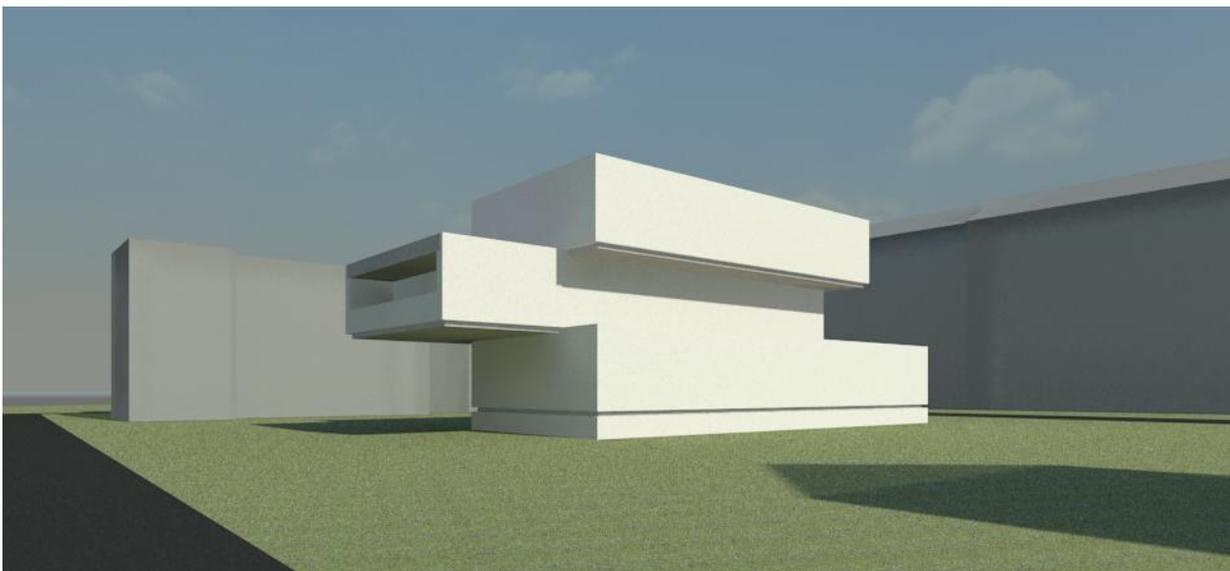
building B, Graz/Austria: structural design with flexible dwelling units
